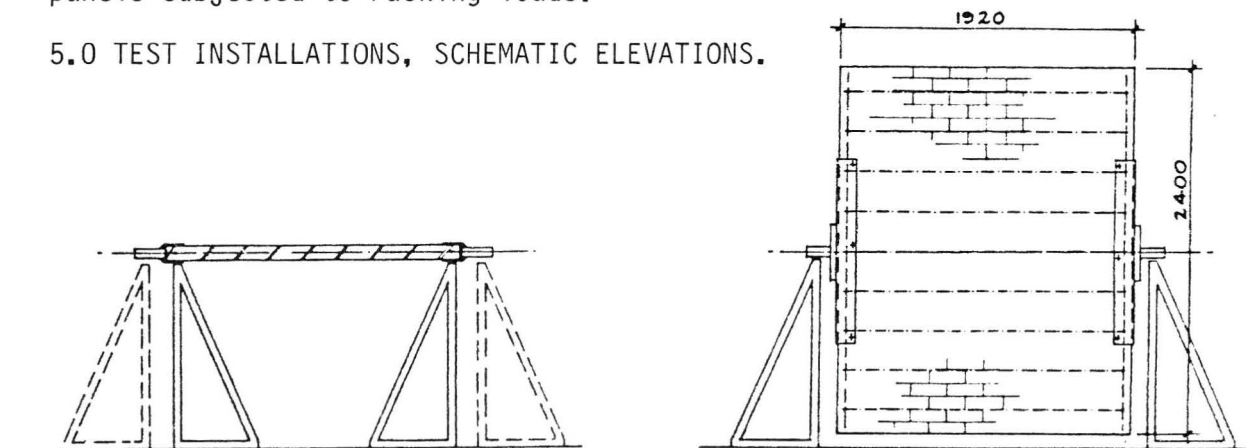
Static face-loaded test arrangement, Panels A and B.
